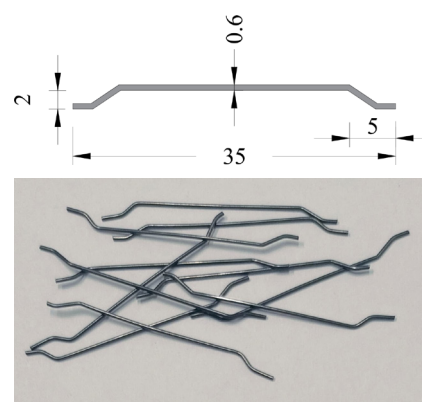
Hooked-end steel fiber (the dimensions are millimeters)
